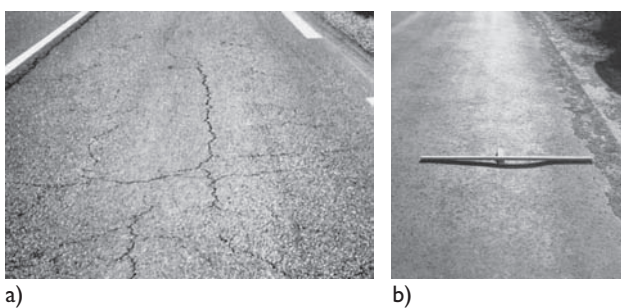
Pavement damage: a) line and grid cracks and b) rutting [1]
